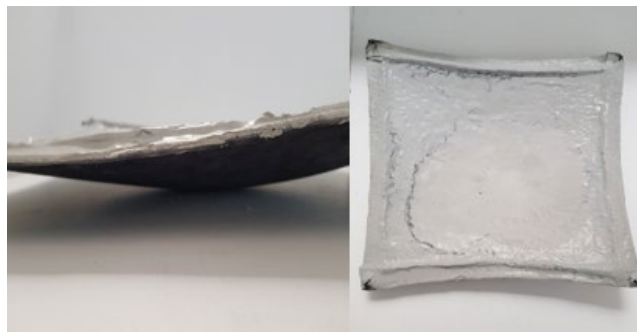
Outcomes from iteration 2 that utilised a spraying technique on flexible formwork to achieve curved concrete geometry
